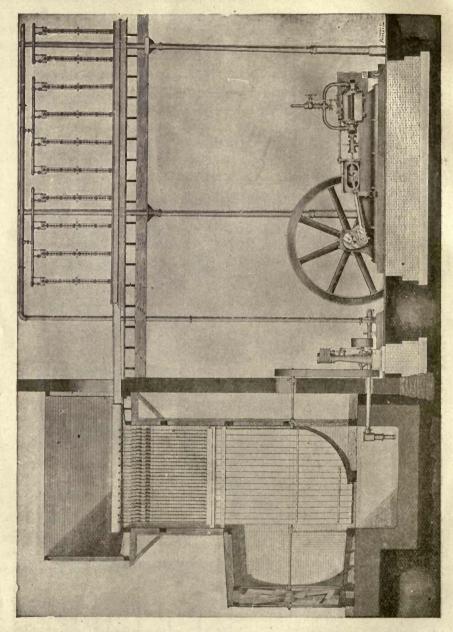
Sectional View of Ruemmeli-Dawley Cooling Tower.
